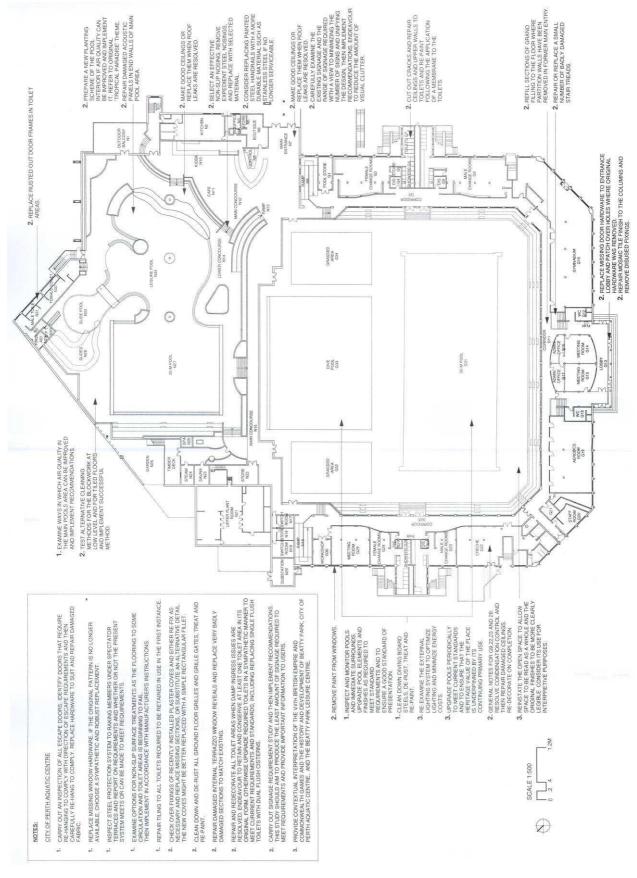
Beatty Park Leisure Centre – Ground Floor Plan (Conservation Works).
